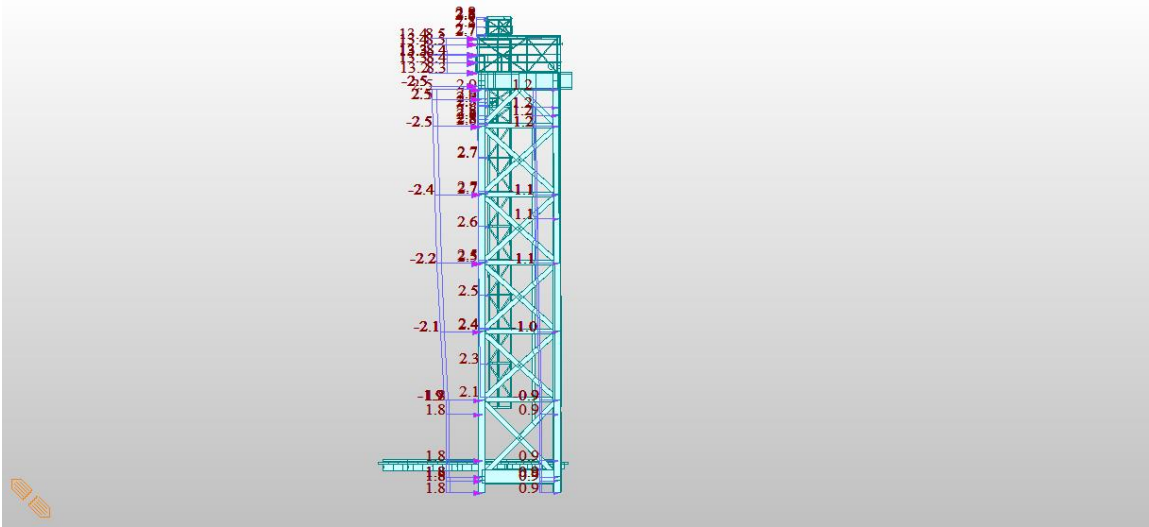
Wind Load Longitudinal 1 (South to North) – Tower
